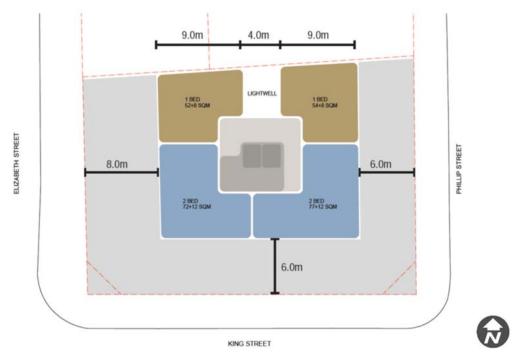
Conceptual floor layout with DCP compliant setbacks above podium (approximately 394 sqm floor plate area).
